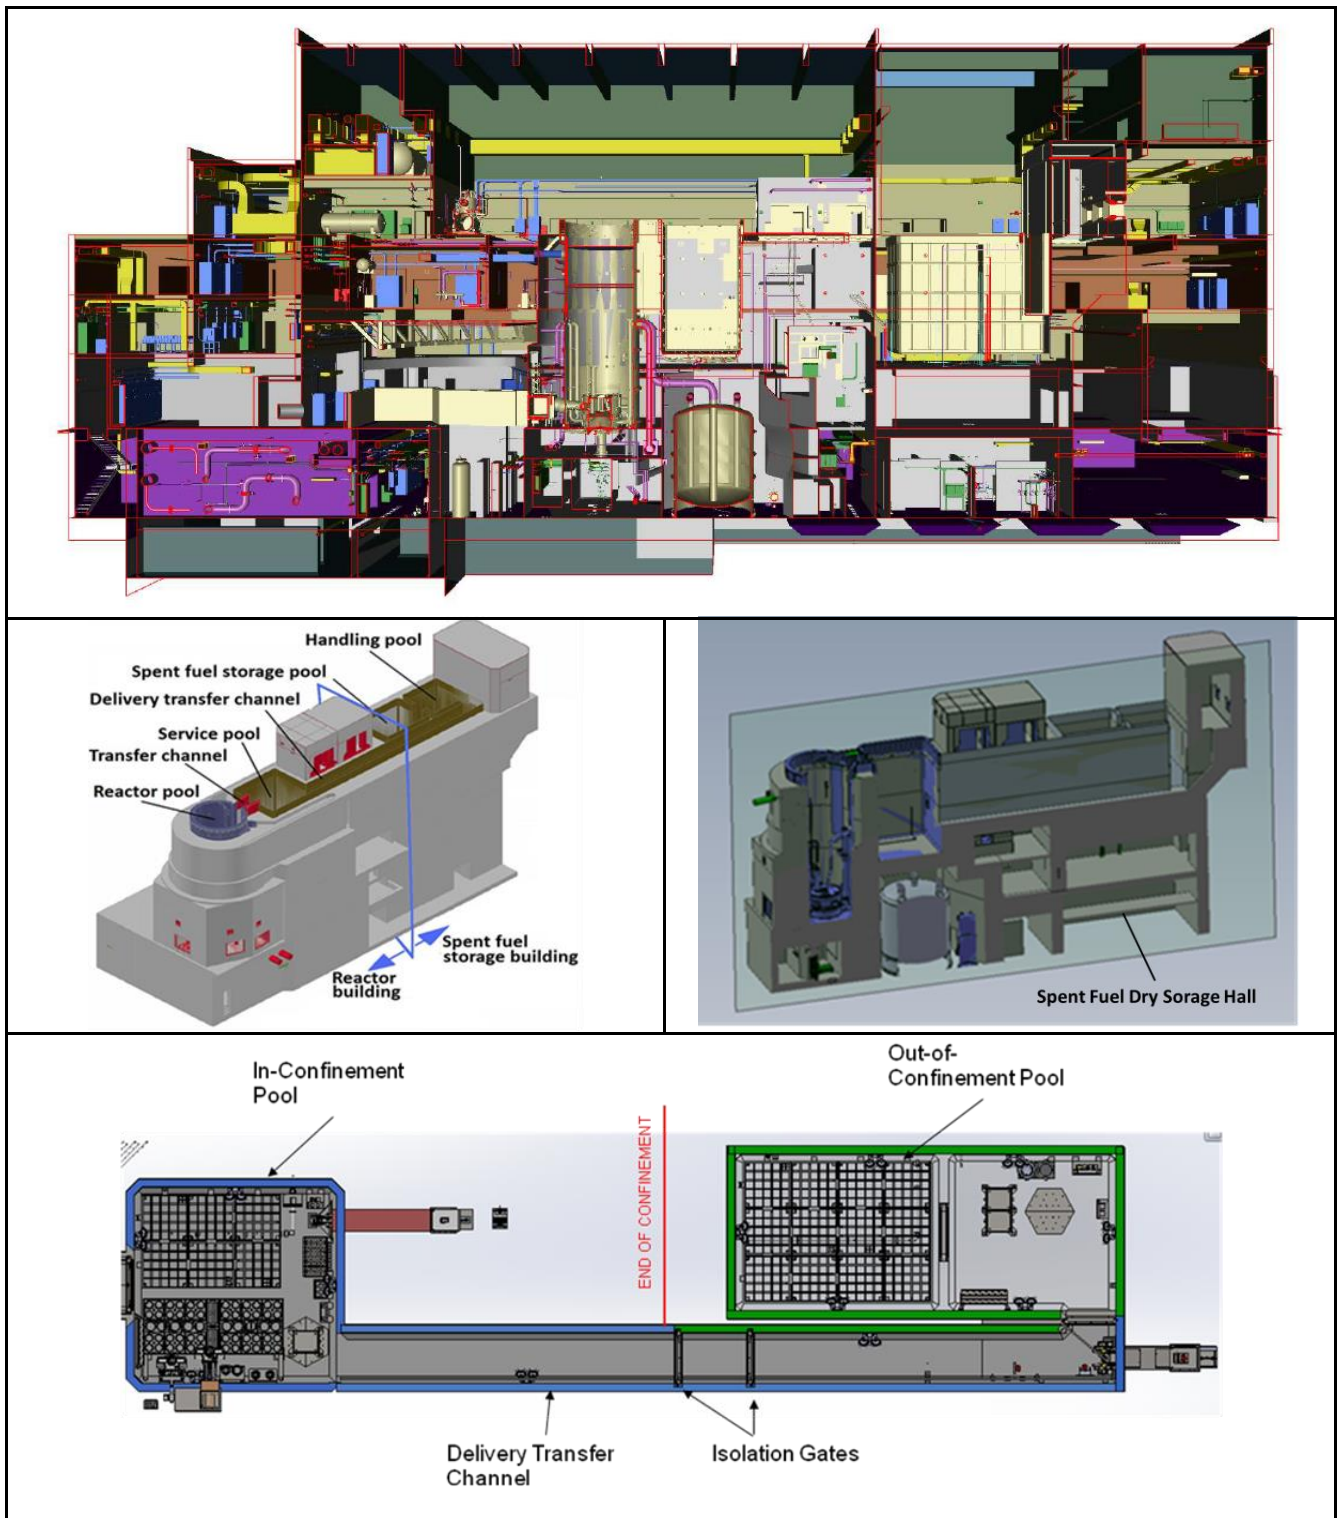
Spent Fuel Storage scheme (building, concrete block, pools)
